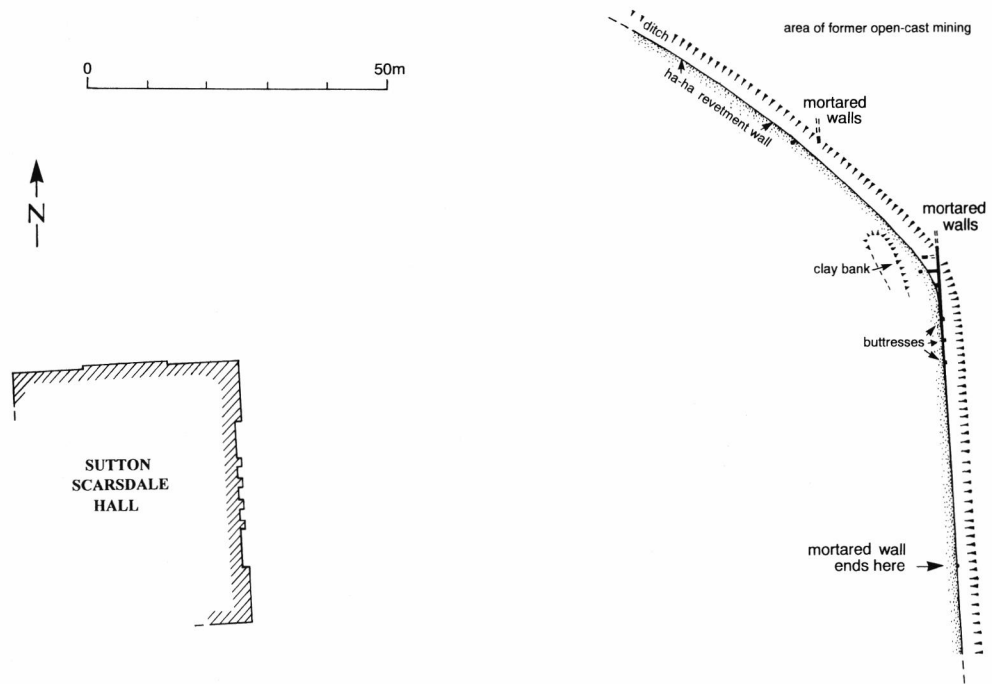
Sutton Scarsdale Hall: plan showing the north-east sector of the ha-ha together with lengths of other walling exposed during recent repair-works; scale 1:1250. *Drawn by R. Sheppard.
